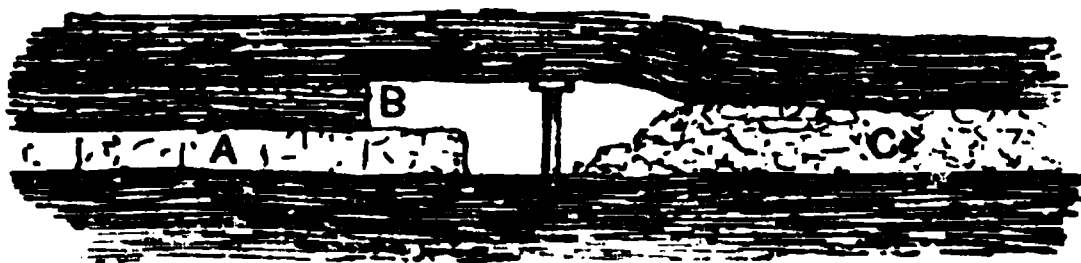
SECTION ACROSS FACE OF LONGWALL WORKING.
